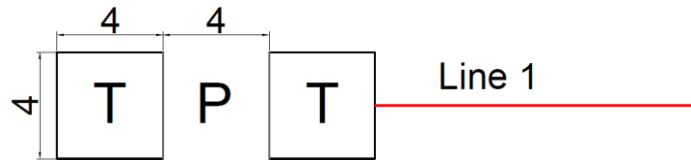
Two horizontal tunnels (T) separated by a pillar (P). The tunnel dimensions in meter and the line for determination of the resultant tangential stresses in a tunnel sidewall are outlined.
